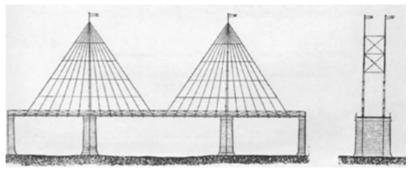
Fan type cable-stayed bridge – Poyet. 1821 [1–3]
